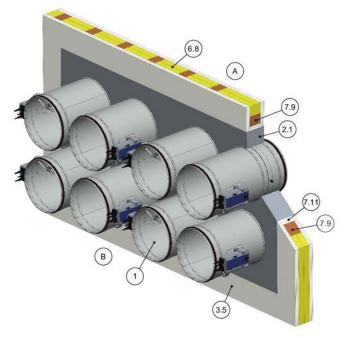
Mortar-based installation - multiple occupancy of an installation opening in timber stud wall
